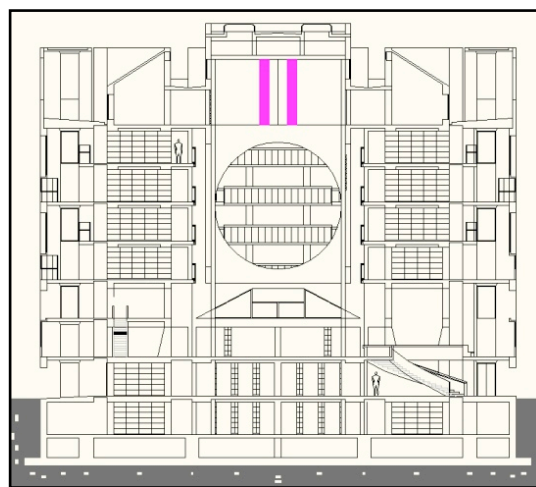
Pink showing bracing concrete beam for bracing central hall and supporting the sky light (Re-Drawn by Author)
